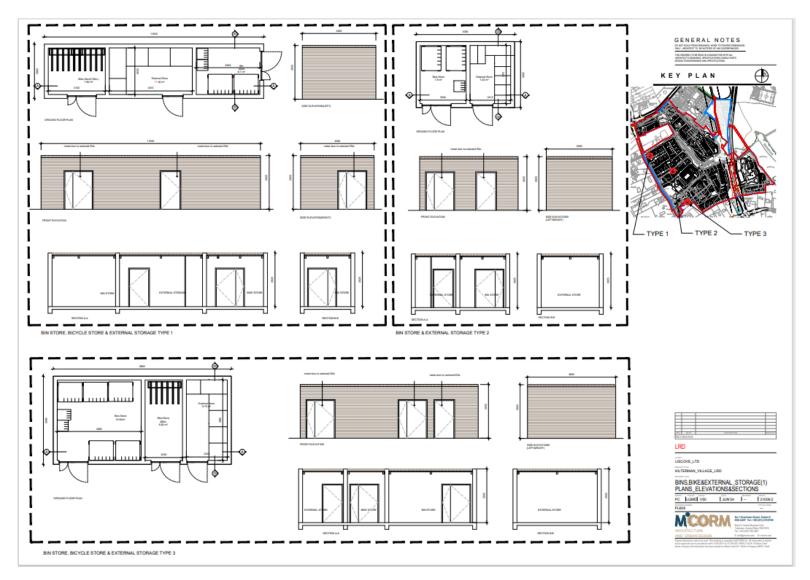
Internal Layout of Waste Storage Area Types 1, 2 and 3
